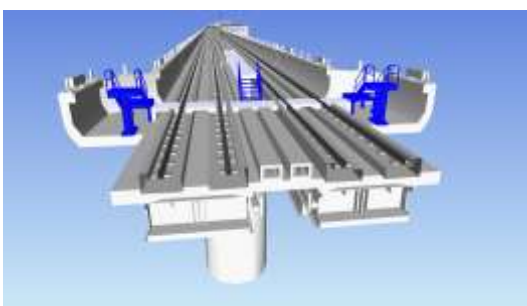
Typical BIM model for elevated sections of Sanyin Line
